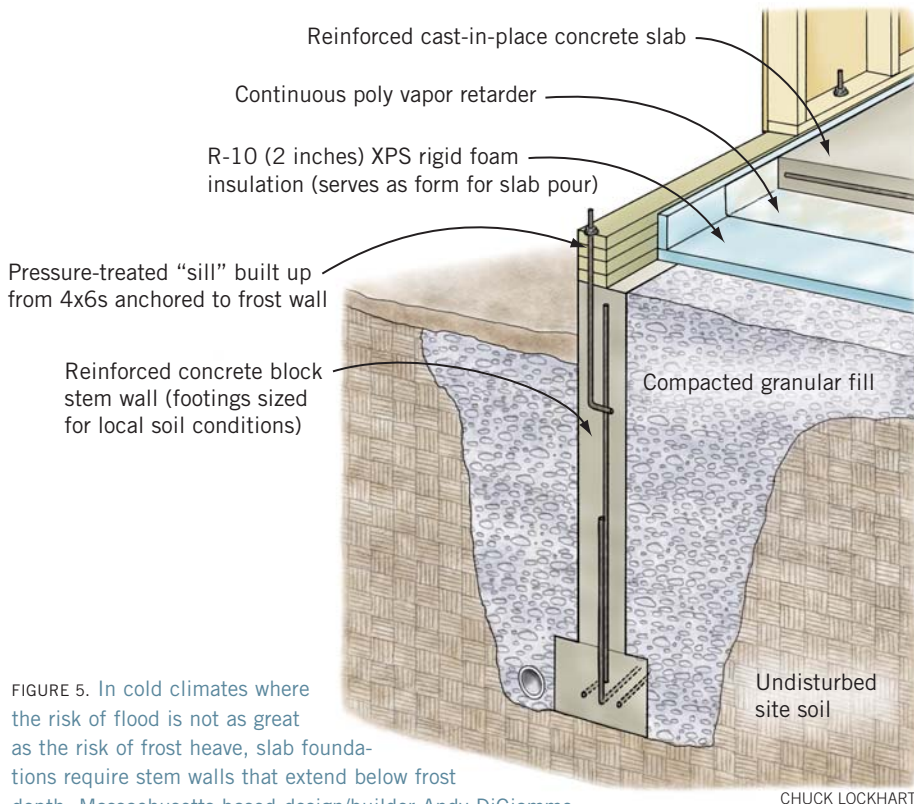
In cold climates where the risk of flood is not as great as the risk of frost heave, slab foundations require stem walls that extend below frost depth. Massachusetts-based design/builder Andy DiGiammo uses this detail where the budget and scale call for an affordable foundation. When the flood risk is high, the stem-wall height can be increased. But if the water table and flood risk are low, DiGiammo prefers to keep the slab near grade for accessibility.
